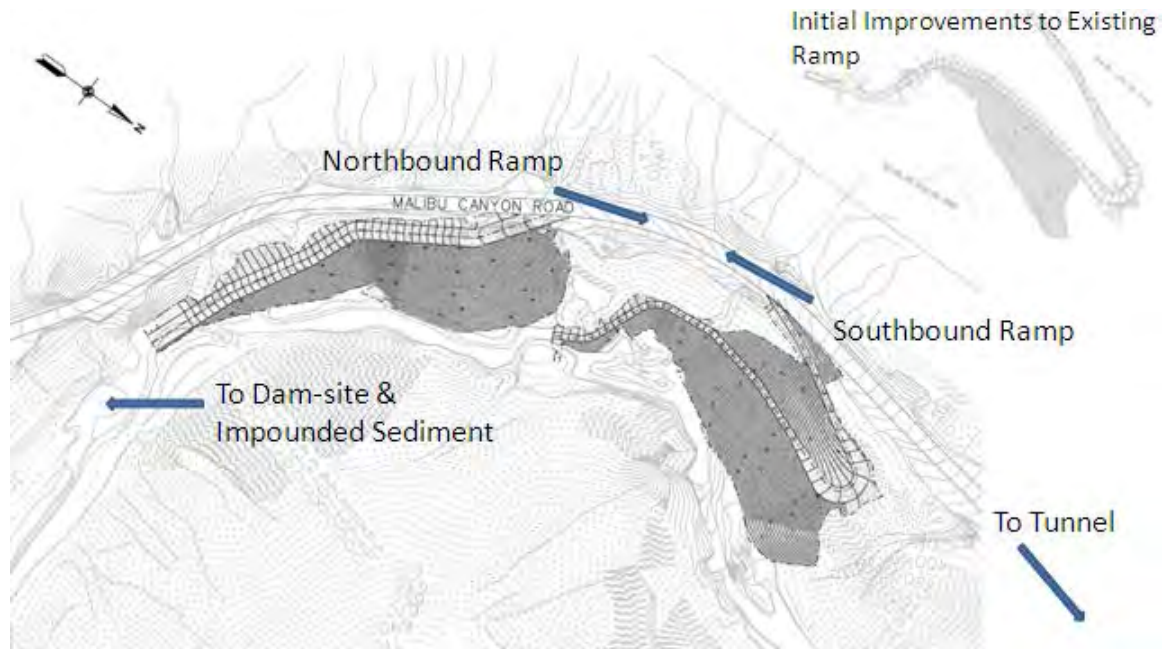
Northbound and Southbound Access Ramp Plans
